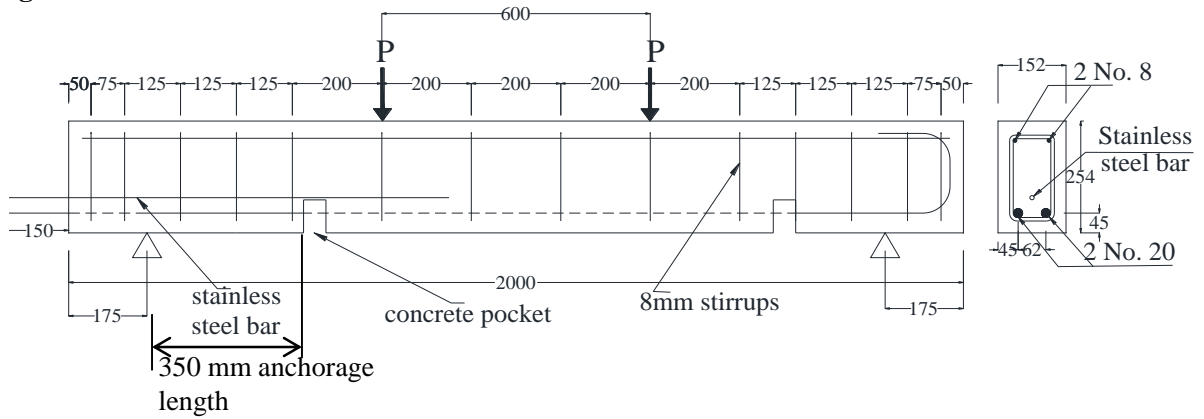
Longitudinal and cross-sectional details for the beams in group 2-Set 2 (All dimensions are in mm). The dashed part of the steel reinforcement represents the unbonded length.
